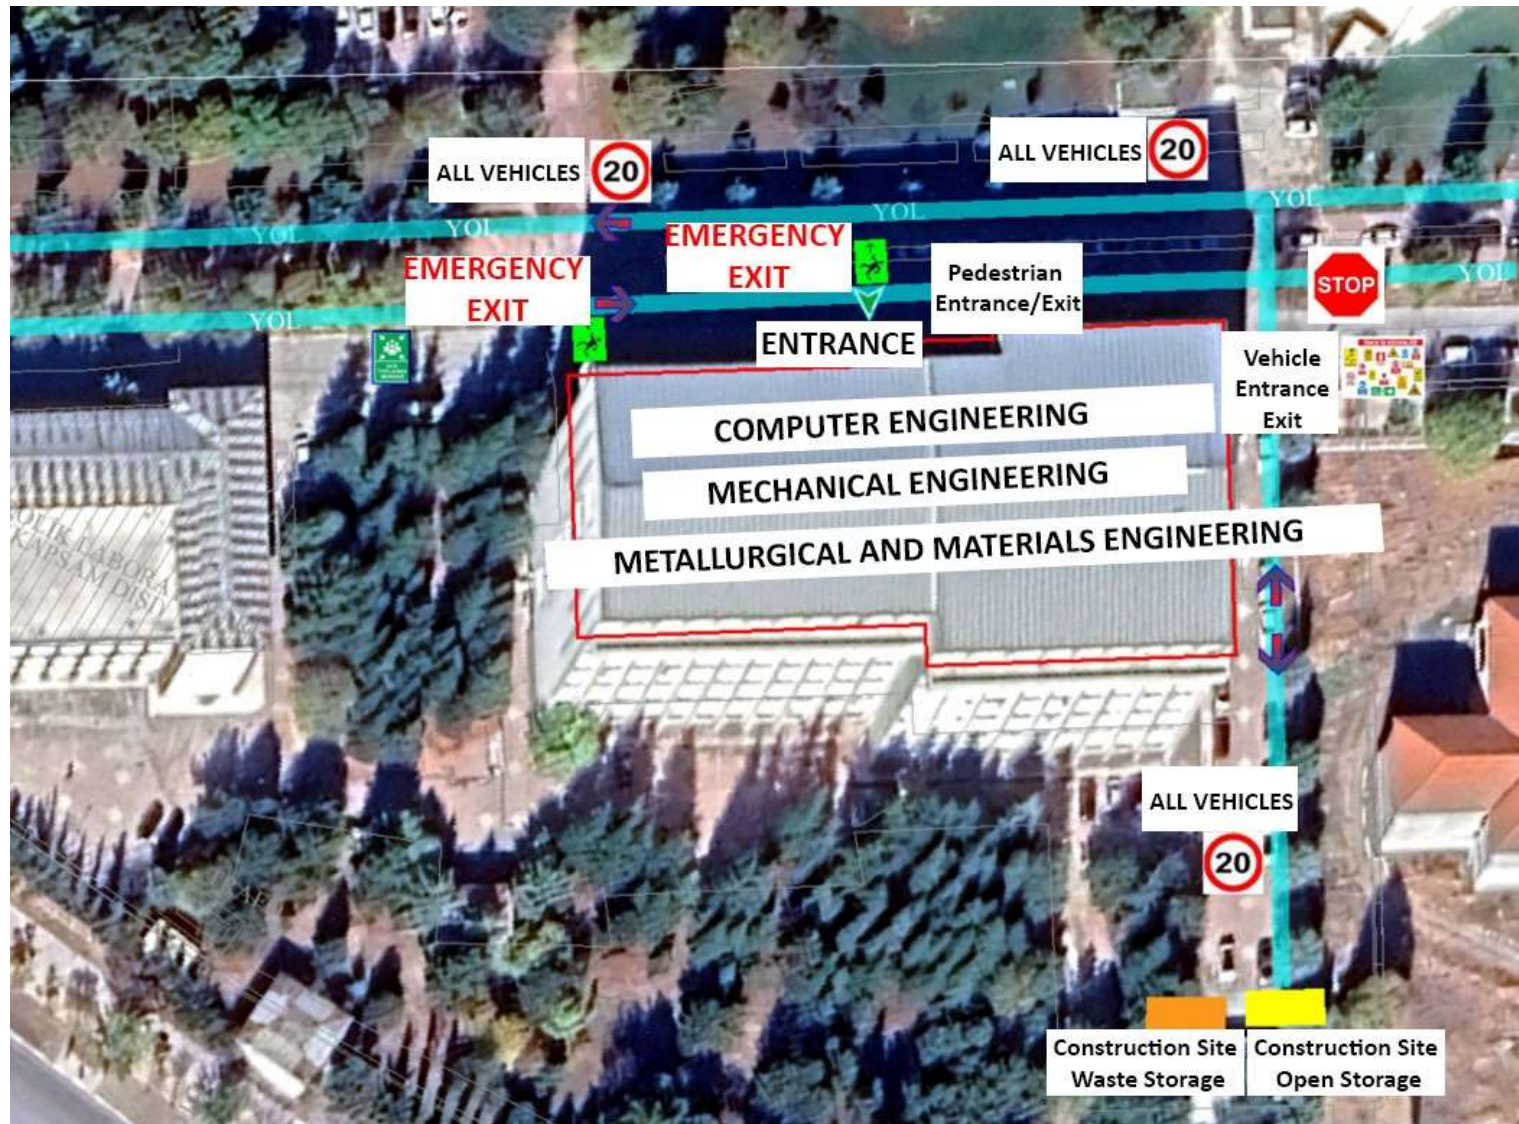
Site Traffic Plan for the Computer Engineering and Metallurgical and Materials Engineering Buildings
